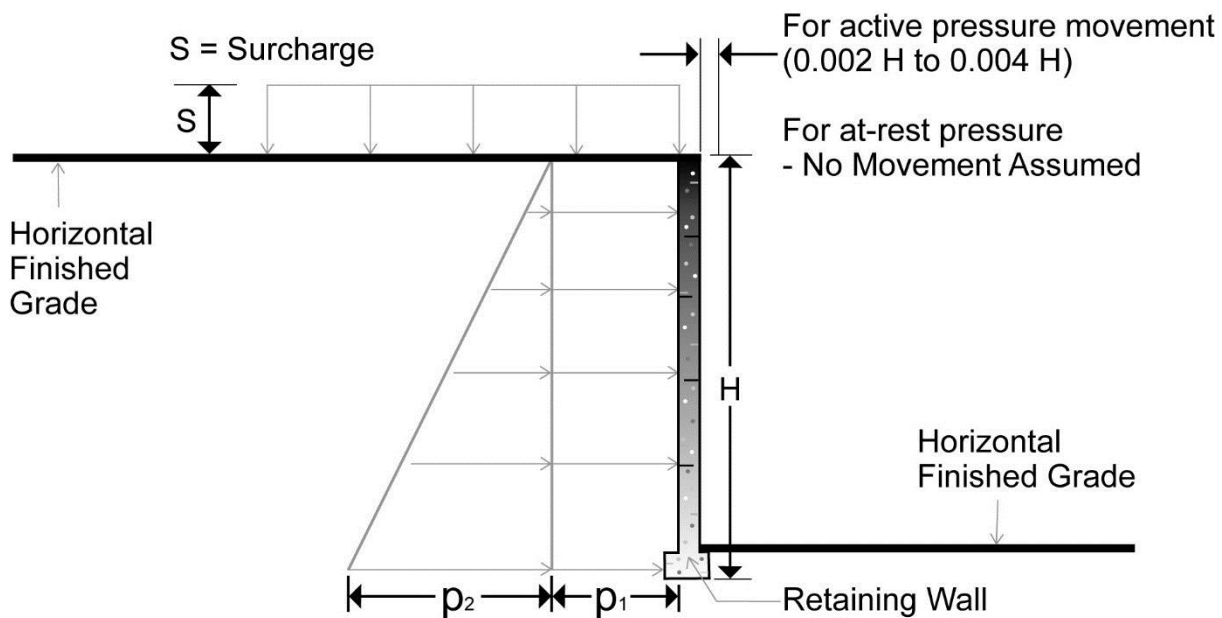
General Diagram of Lateral Earth Pressures acting on Retaining Walls
